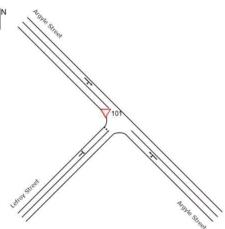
Geometric layout – Argyle Street / Lefroy Street intersection
